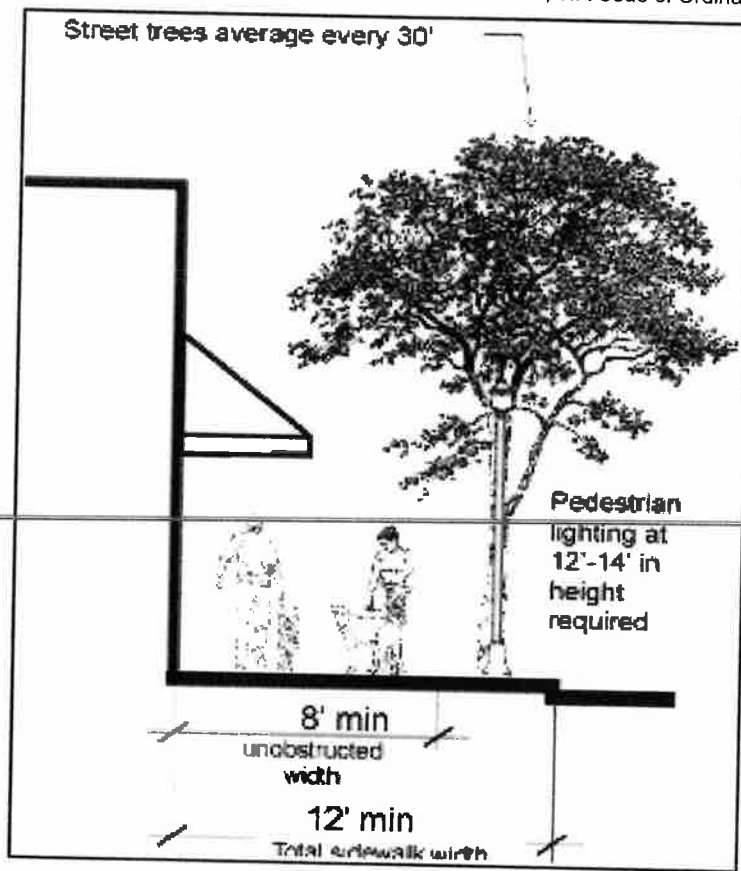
Sidewalk Requirements Primary Pedestrian Corridors
